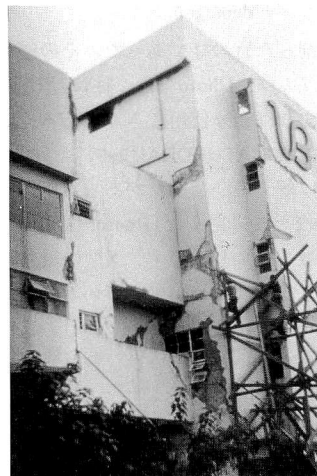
(e) University of BAGUIO College of Commerce North side view,
